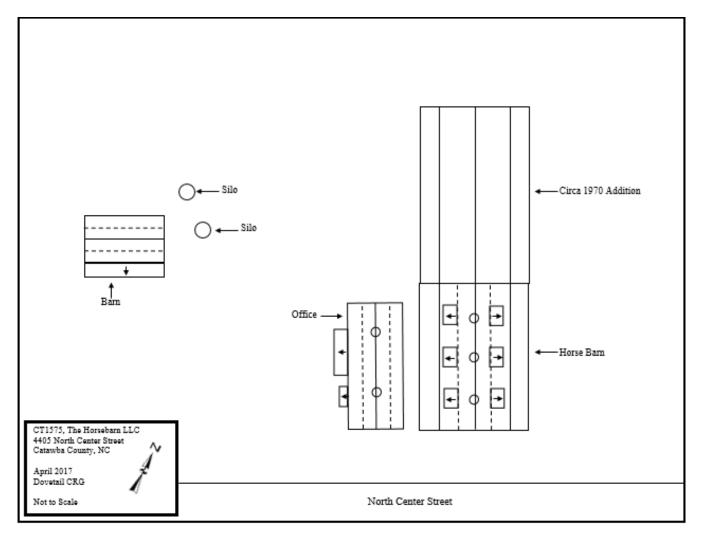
Site Plan for The Horsebarn LLC (CT1575).
